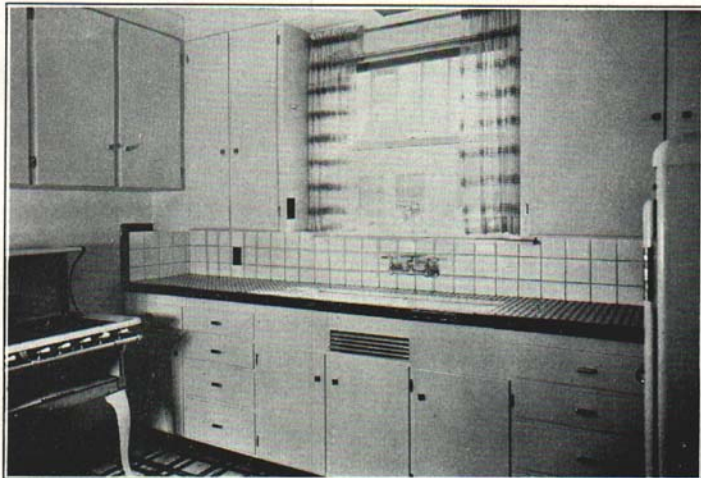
A compact convenient kitchen arrangement. Notice these features: light in ceiling above sink, wall outlets for small electrical equipment, cupboards on wall space over the range, glazed tile working surface, double sink, ventilated cupboard below sink, and toe space at bottom of cupboard.
